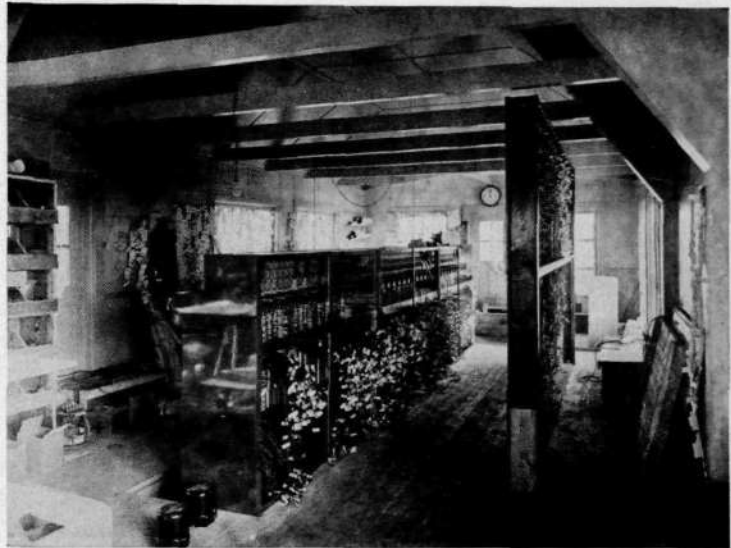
Fitting of the interlocking frame and illuminated track plan, back view.
